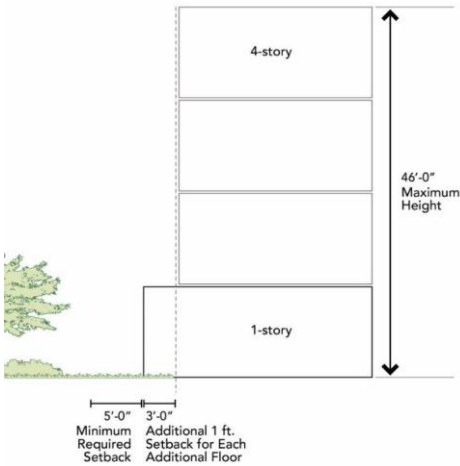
R-1 Corner Lot Side Setbacks
